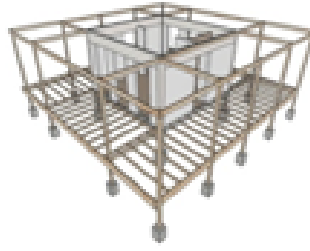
Wooden Structural Module (Parodi et al., 2020).
